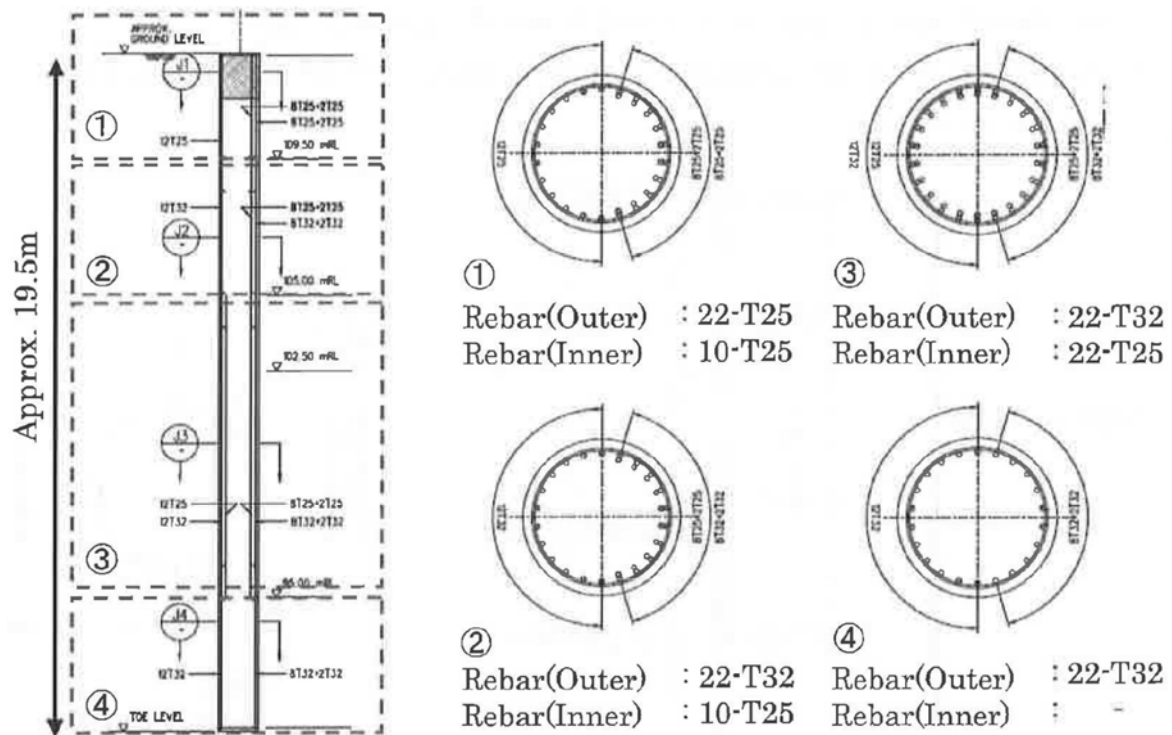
Typical rebar arrangement of original design(SBP-34C)
